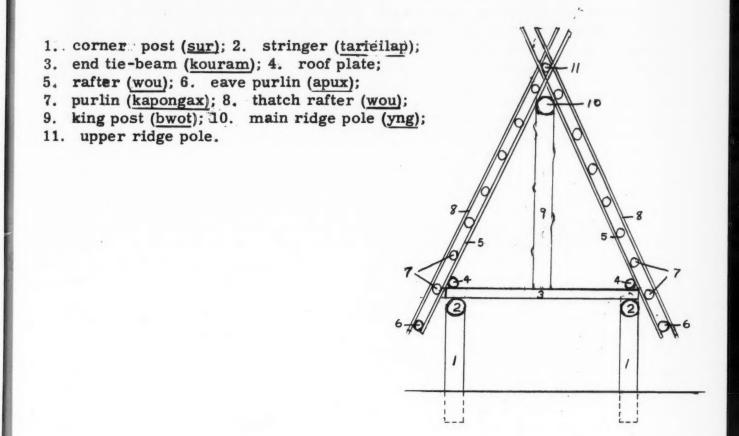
Construction of Ifaluk dwelling (im) or canoe-house (fan ni wa); end elevation.
